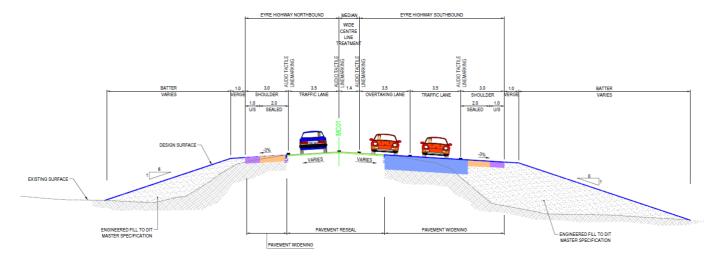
Typical cross section, section taken at MC01 CH 420 (looking north).
